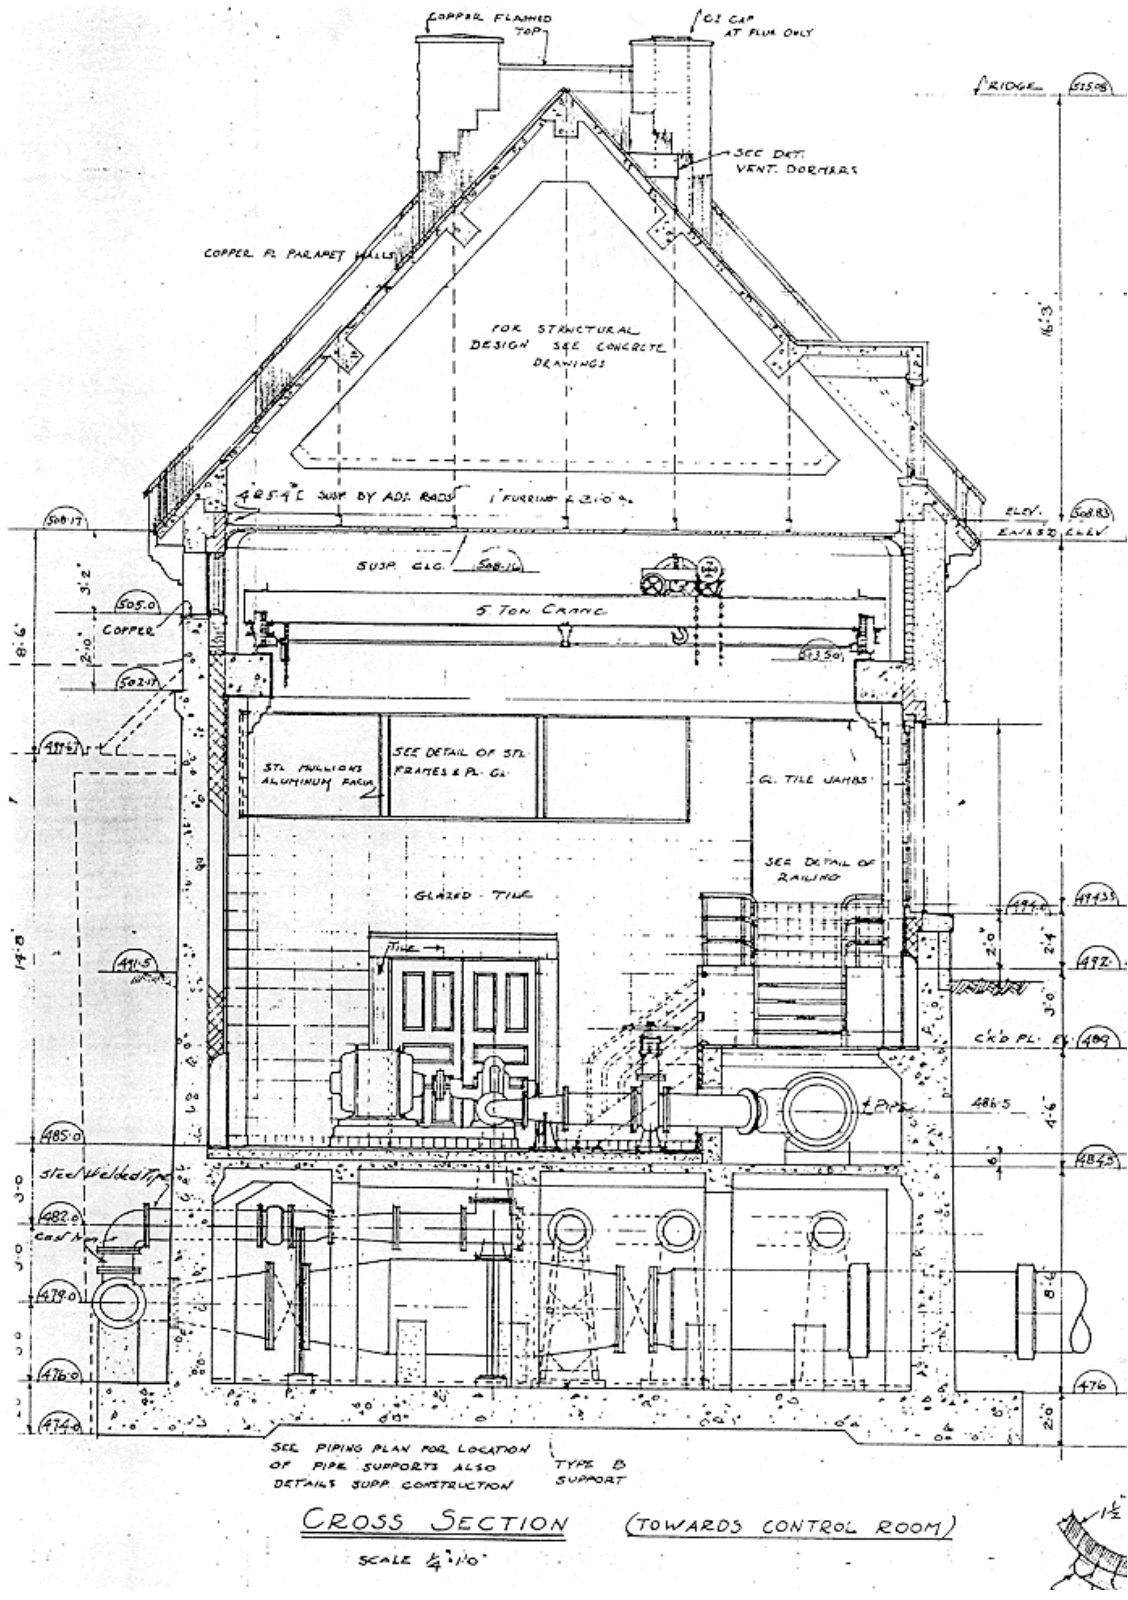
Côte-des-Neiges pumping station, Cross section, 1937
